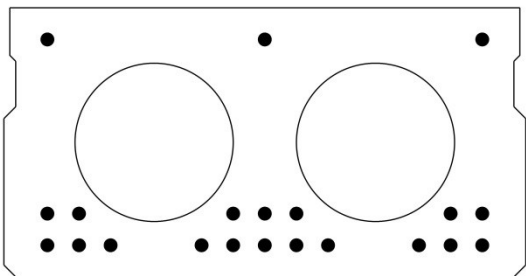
Ward Creek - Span 4 - Slab 5, typical strands
